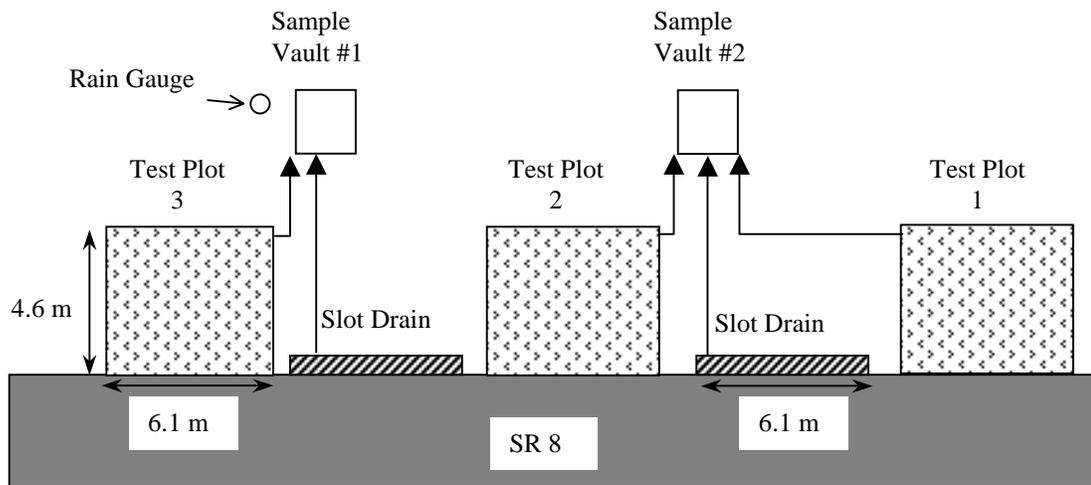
Plan view simplified schematic diagram of experimental site showing runoff on SR8 (not to scale).
